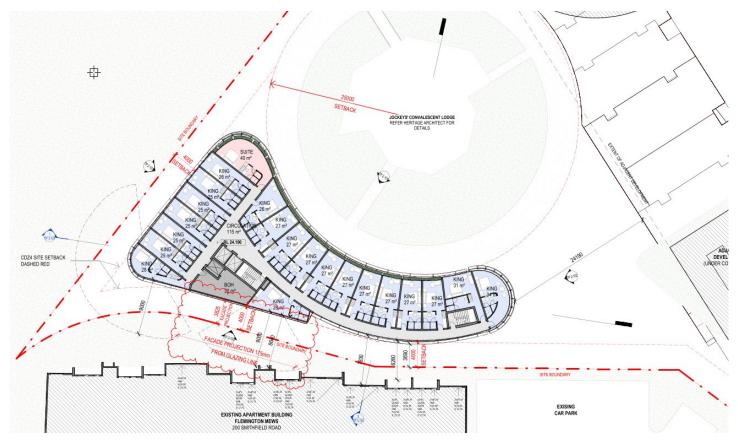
Extract of Level 2 plan, which is a typical floor plate of the building
